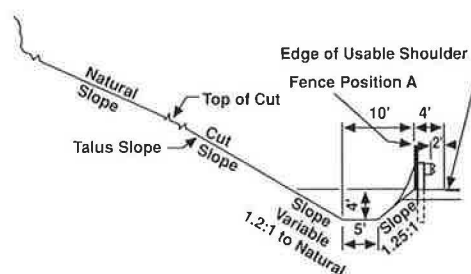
Roadway section on talus slope—Design B, fence position A.
